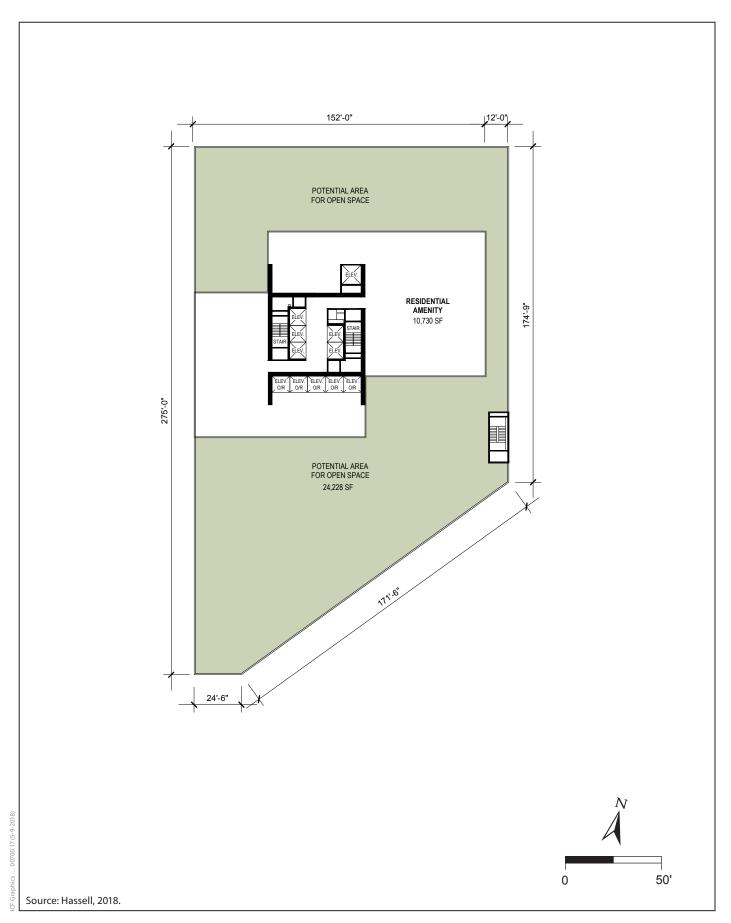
30 Van Ness Avenue Project – Proposed Level 1 Plan
